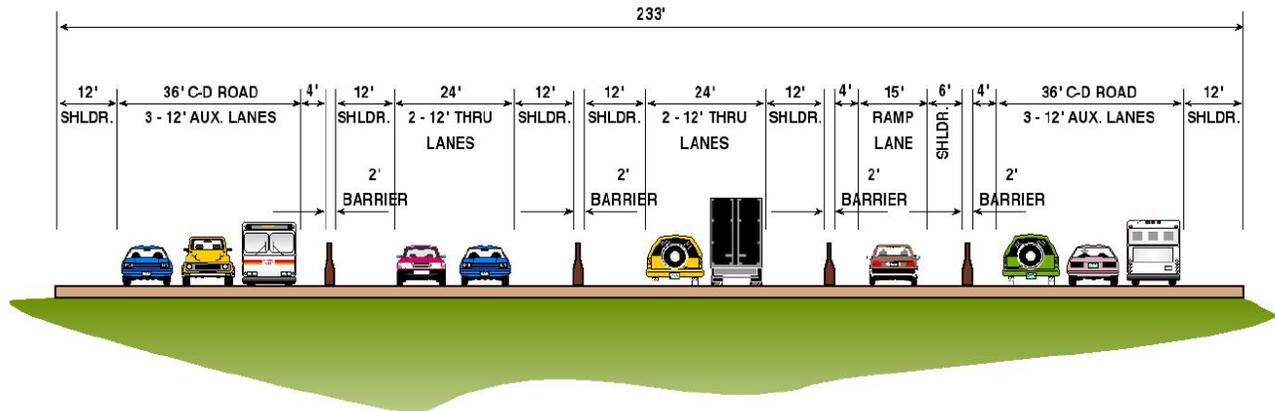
US 6 Typical Section, Preferred Alternative, Looking East
